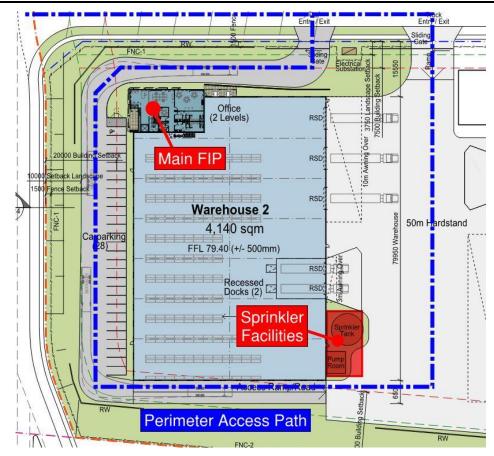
Fire Brigade Access and Site Facilities – Warehouse 2
